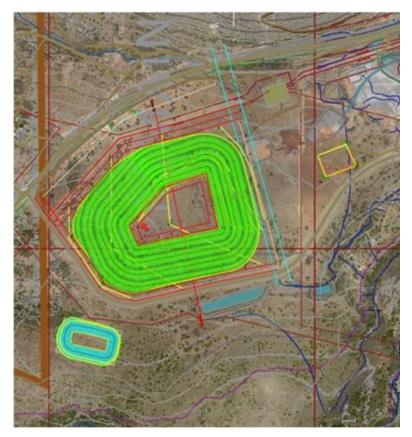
Site B Preliminary Layout with PCD located on Portion 6 of the farm Dwarsrivier 372KT (initial layout)
